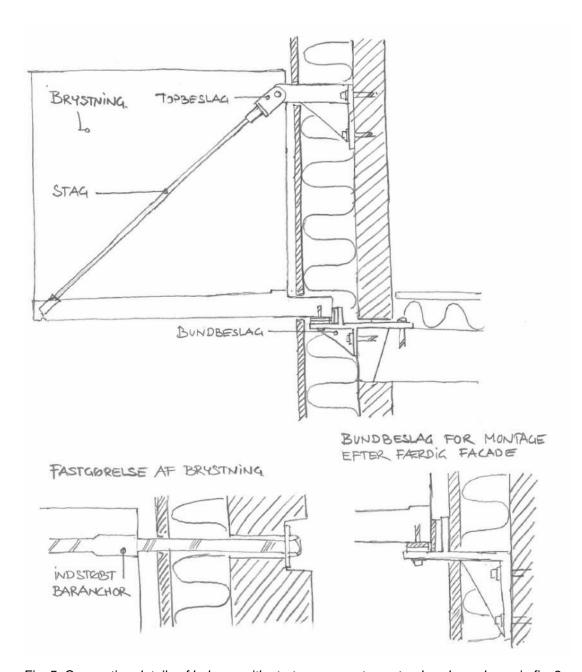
Connection details of balcony with struts or concrete upstand such as shown in fig. 2.
